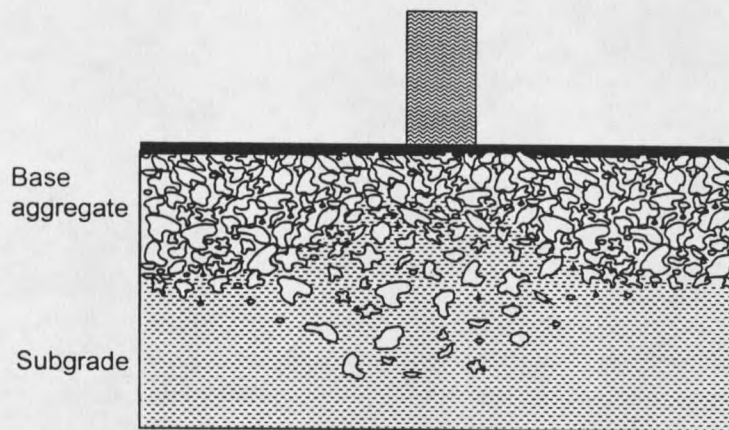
Illustration of mixing of the base and subgrade, where addition of geosynthetic would be beneficial as a separator.
